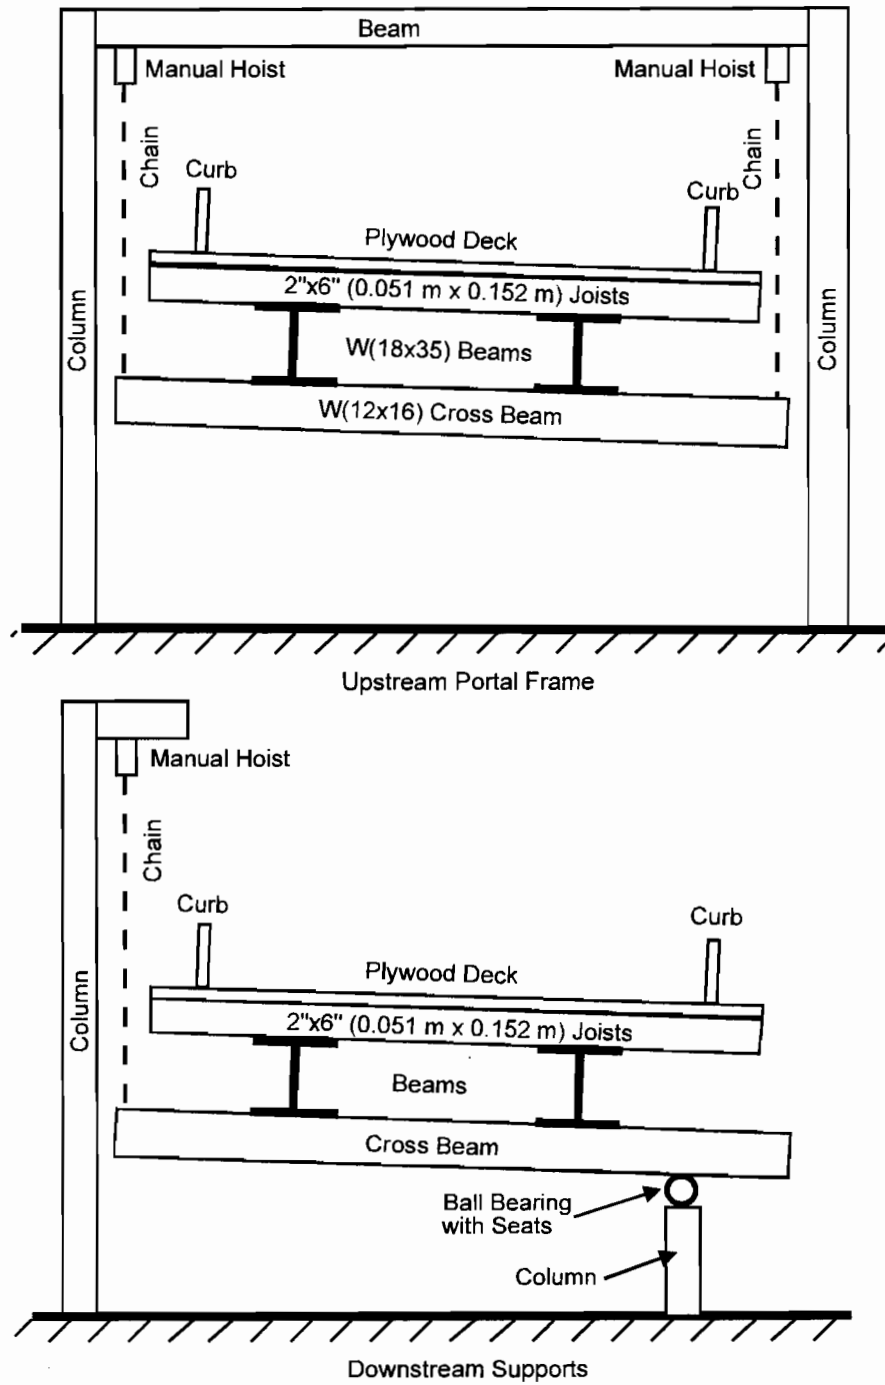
Cross-Sectional Diagram of Primary Structural Components of Model (Looking Downstream)
